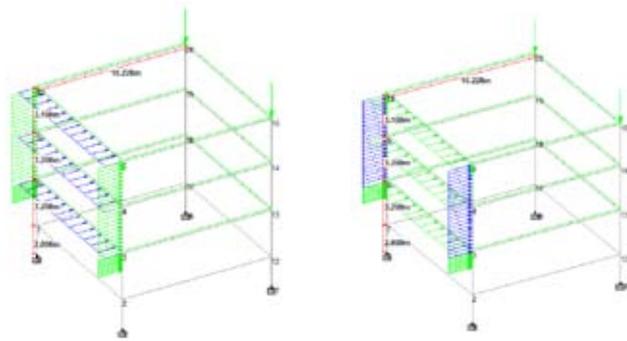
Horizontal loads on beams and pedestals in longitudinal and Transverse direction
